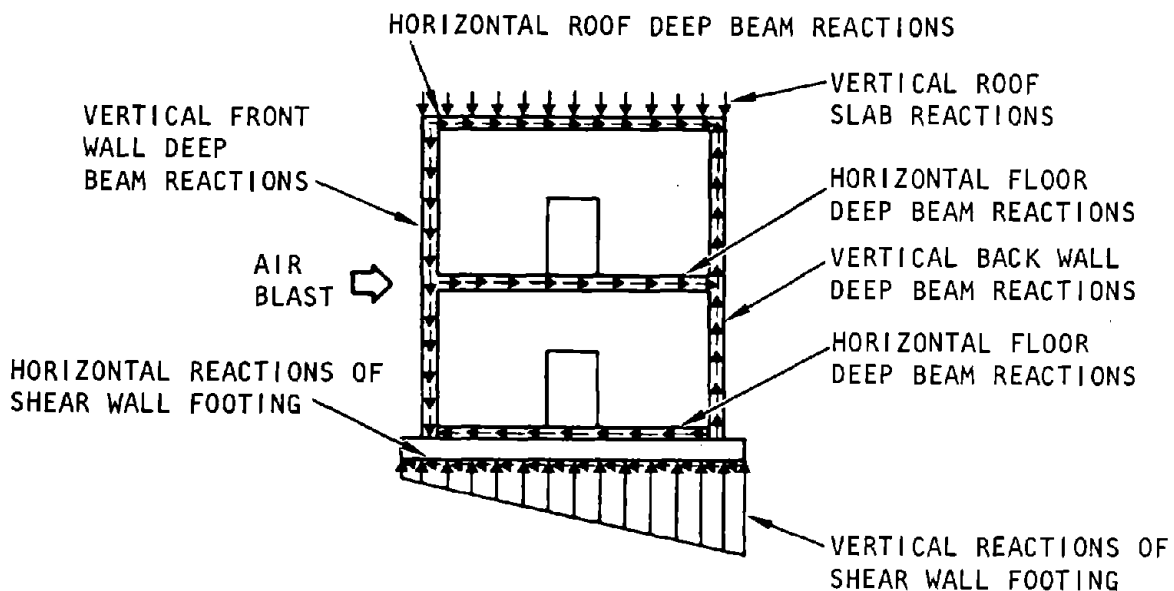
Forces Acting on Shear Wall (COE, 1958)
